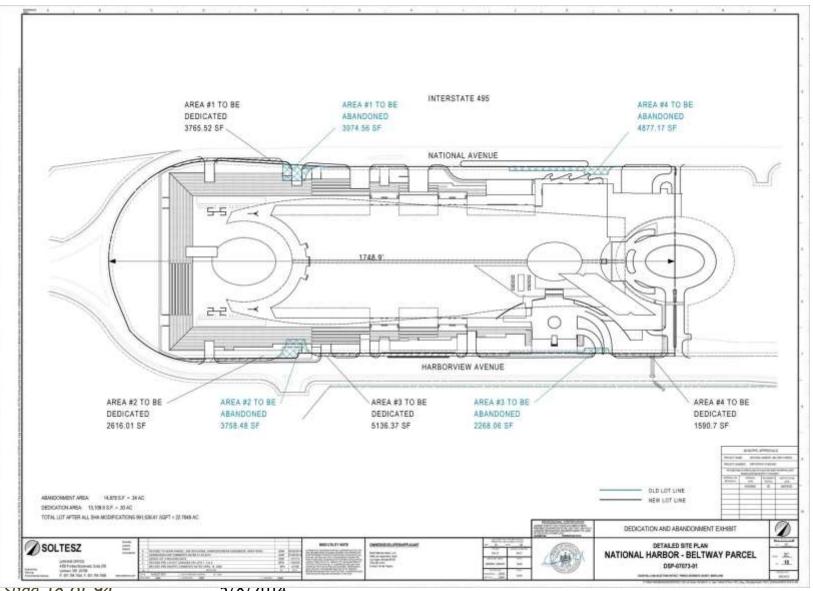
DETAILED SITE PLAN SET (PAGE 2B OF 10)
